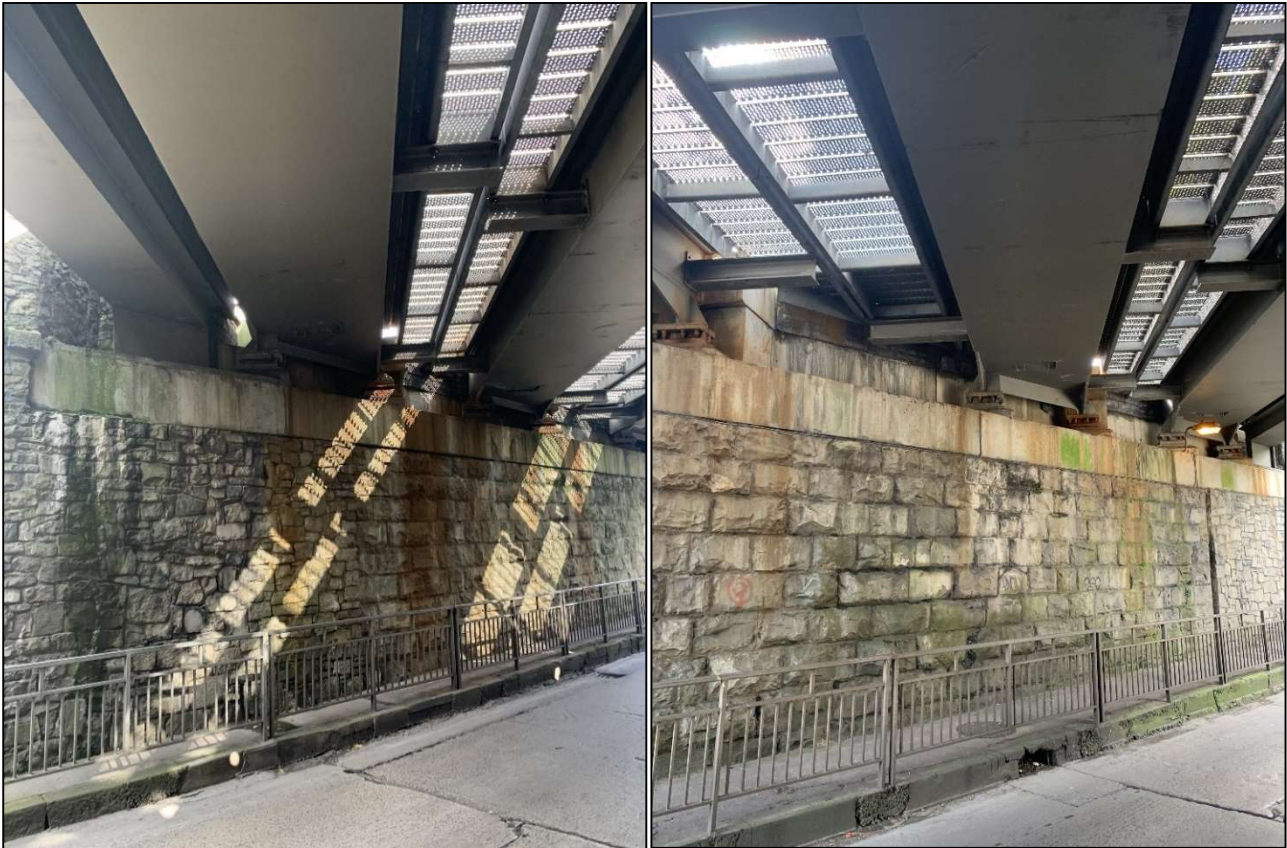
Sarsfield Road Bridge (UBC4) East & West abutments
